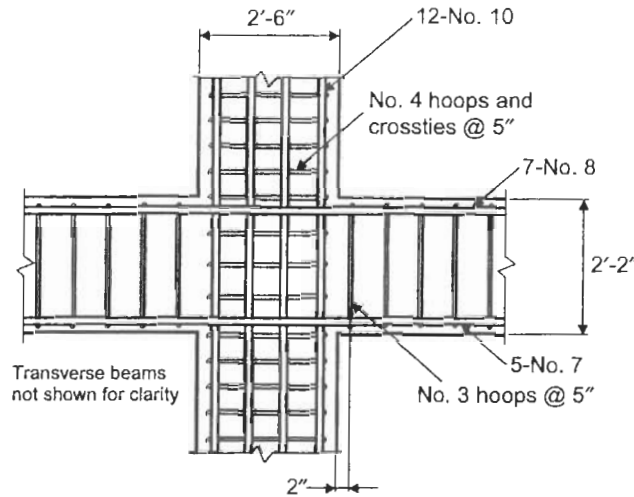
Reinforcement Details at Interior Beam-Column Joint (SDC D)
